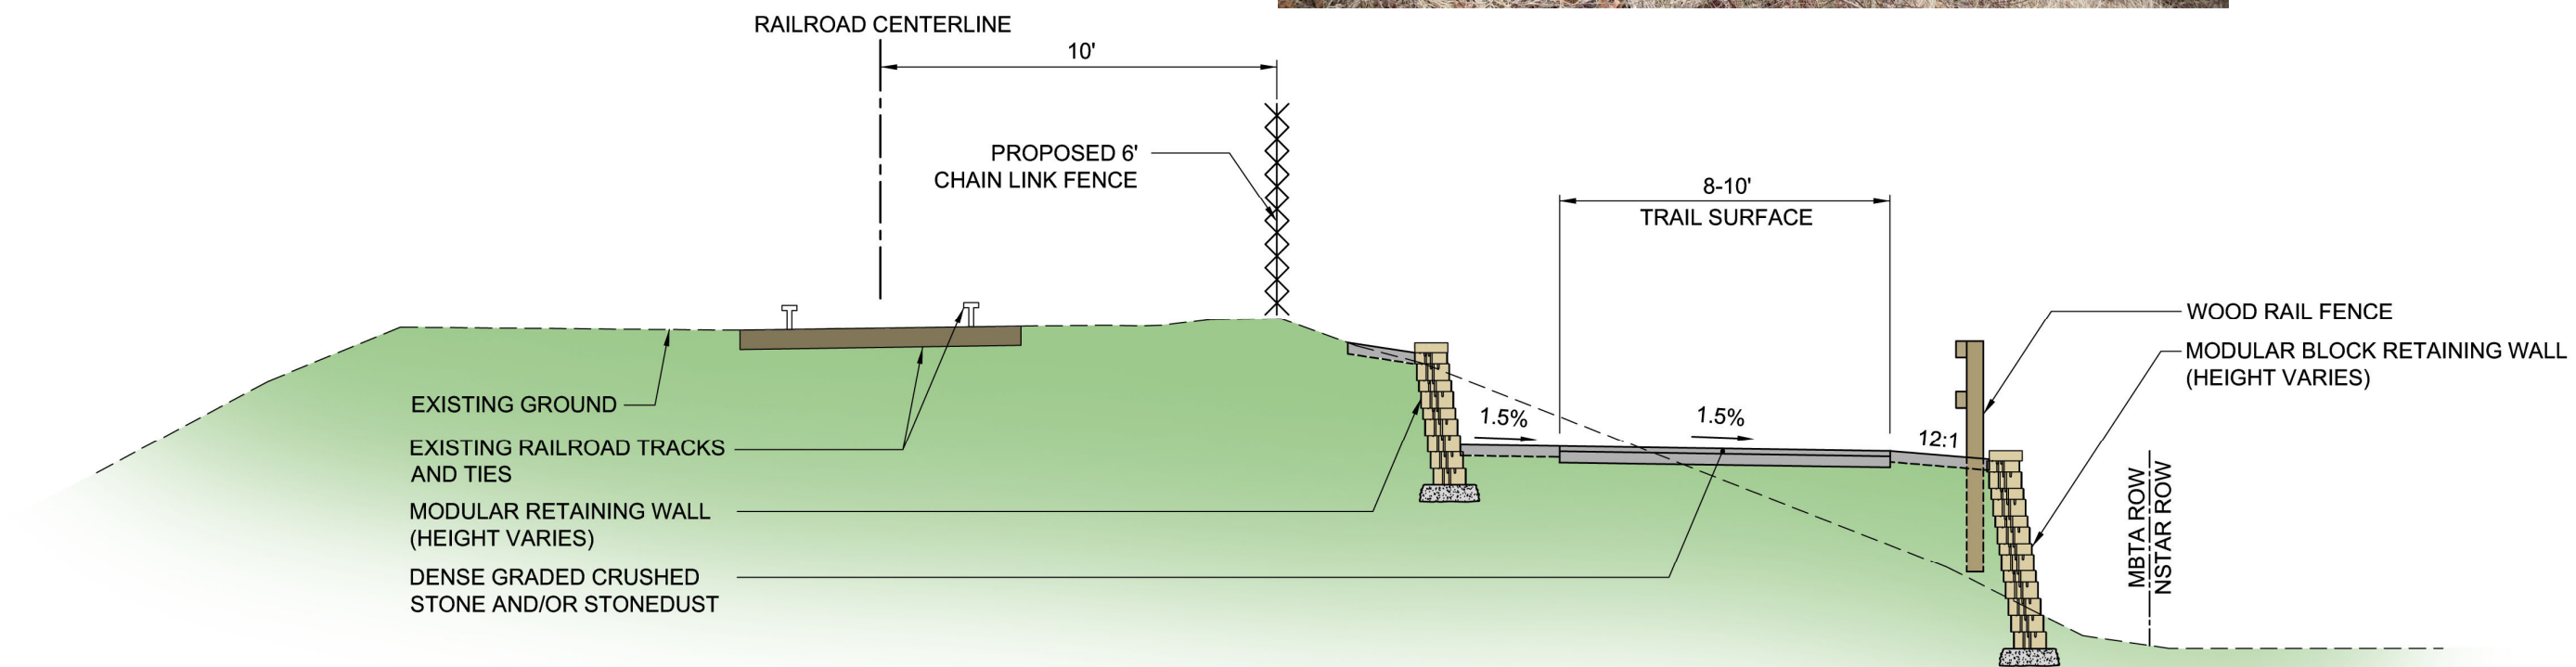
C: Alternative 1 – MBTA ROW Conceptual Typical Section
